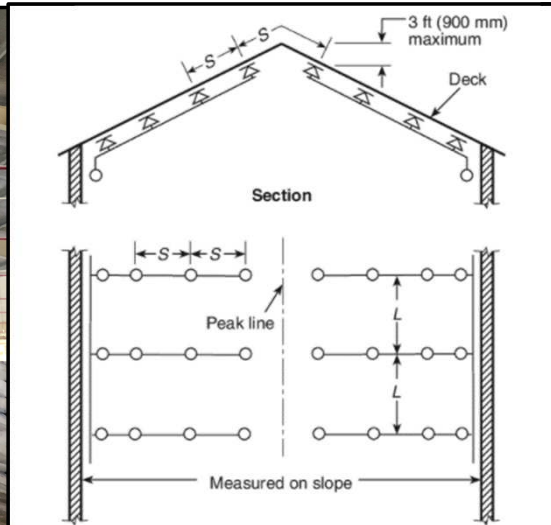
(b) Sprinklers at Pitched Roof; Branch Lines Run Up Slopes.
